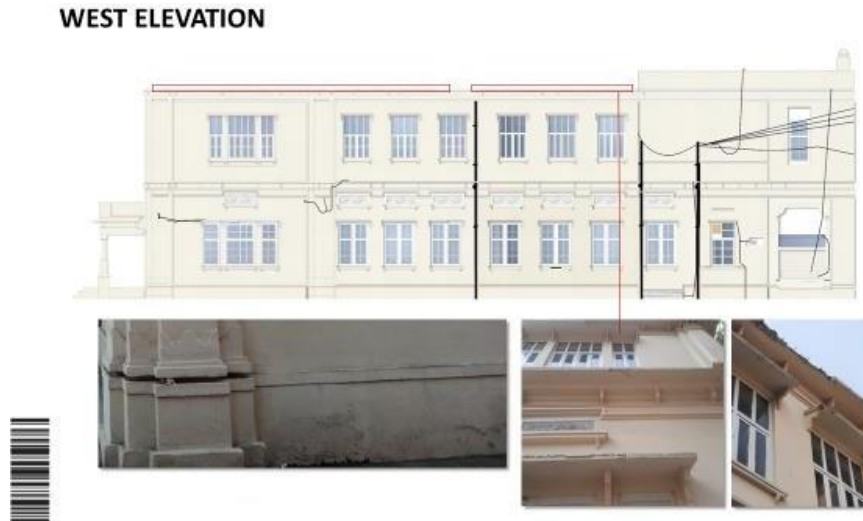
WEST ELEVATION OF GANGA RAM BUILDING, LCWU, LAHORE.
